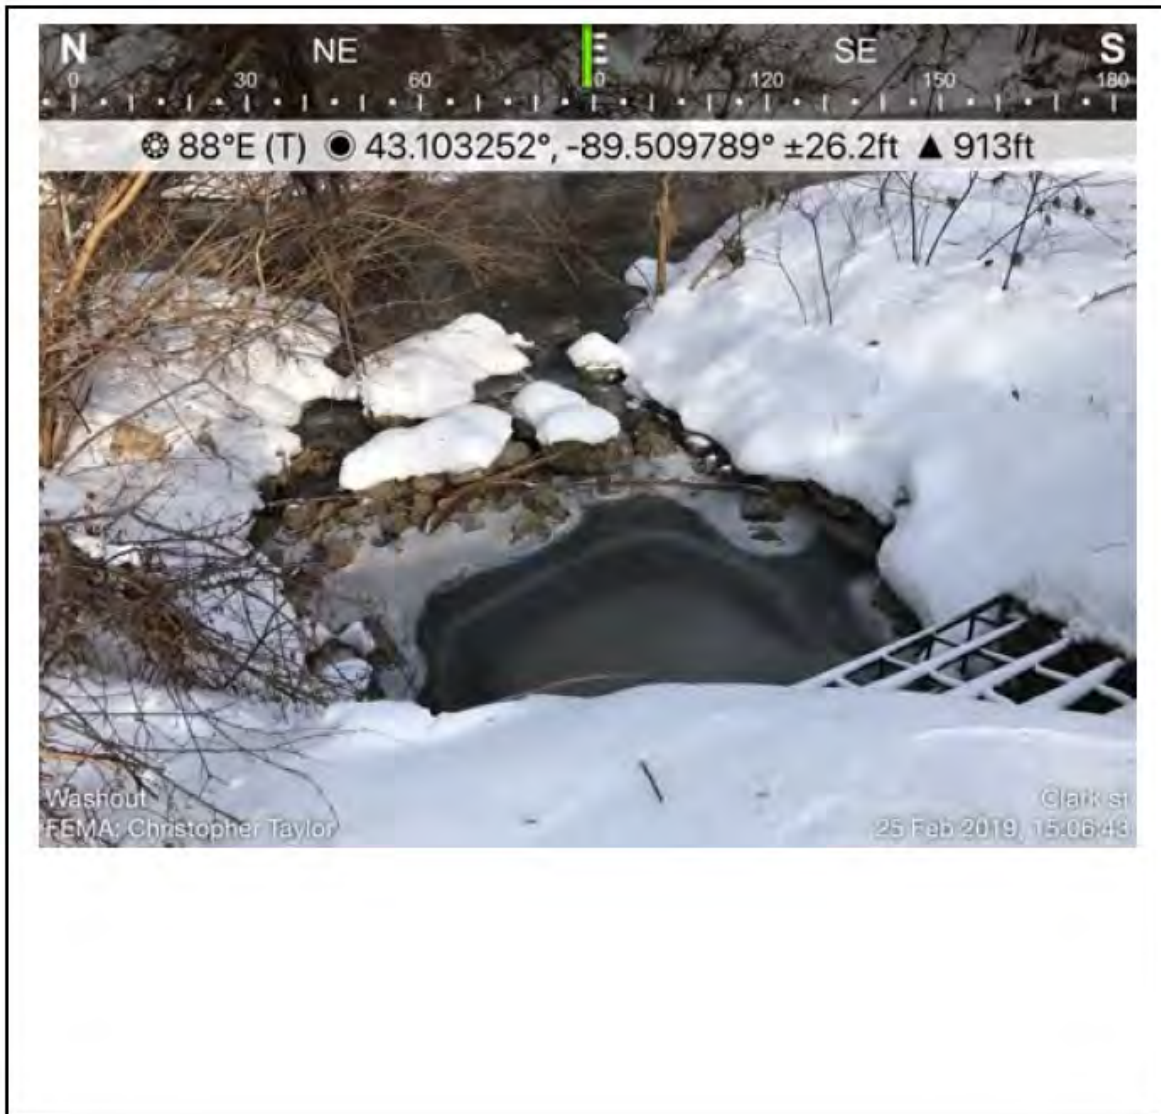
Site 5 (February 2019) taken at 43.103252, -89.509789. View of minor washout of rip-rap surrounding Clark Street stormwater outfall.
